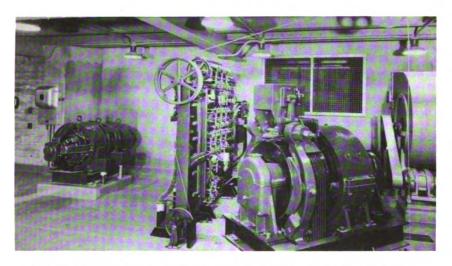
Elevator machinery room, motor-generator set at left—Chickamauga.
